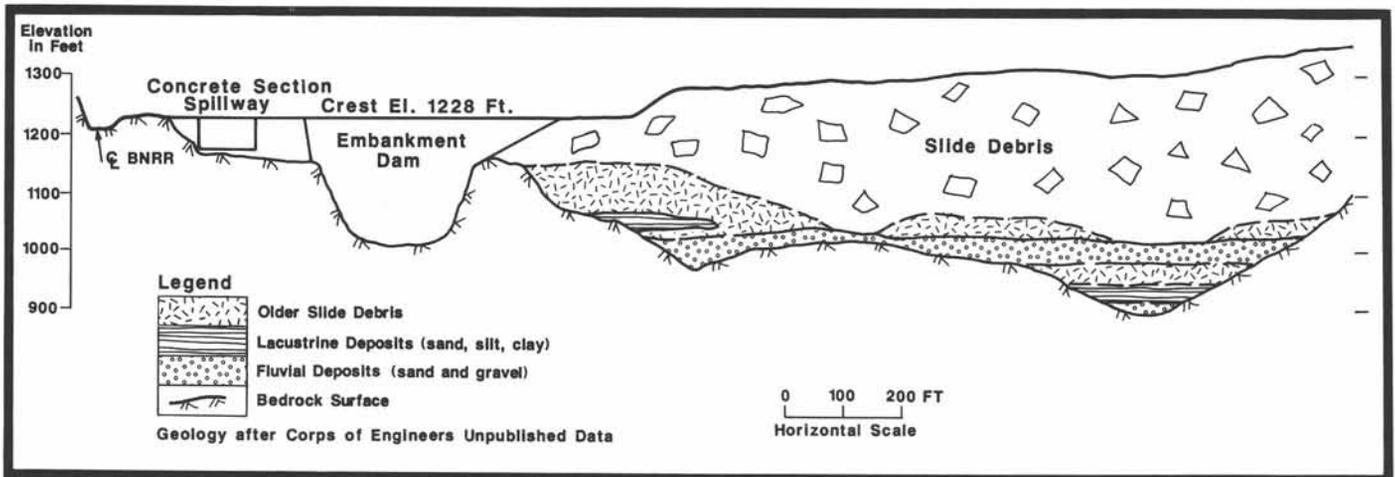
Geologic section at Howard Hanson Dam; view downstream.
